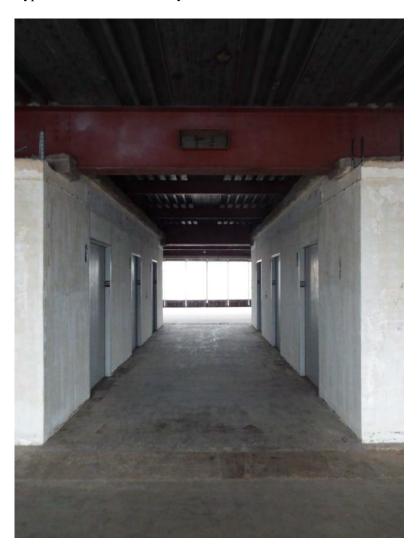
Typical historic ceiling at elevator lobbies Ceiling remains at main public spaces
